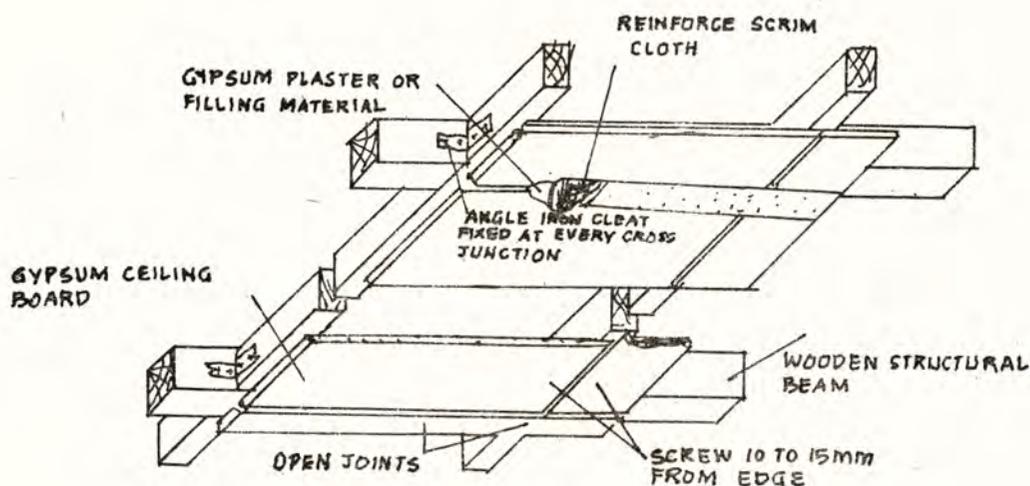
FINISHING TREATMENT FOR JOINTS IN GYPSUM BOARD CEILING.
